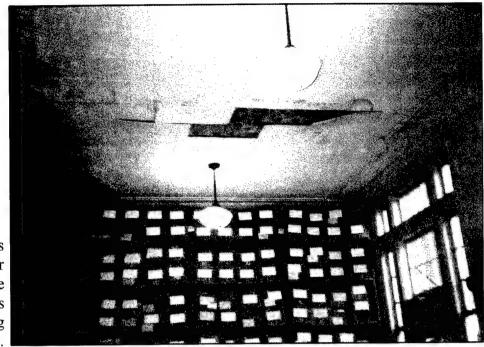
Collections are subject to water damage from the broken ceiling tiles and the leaking ceiling.
